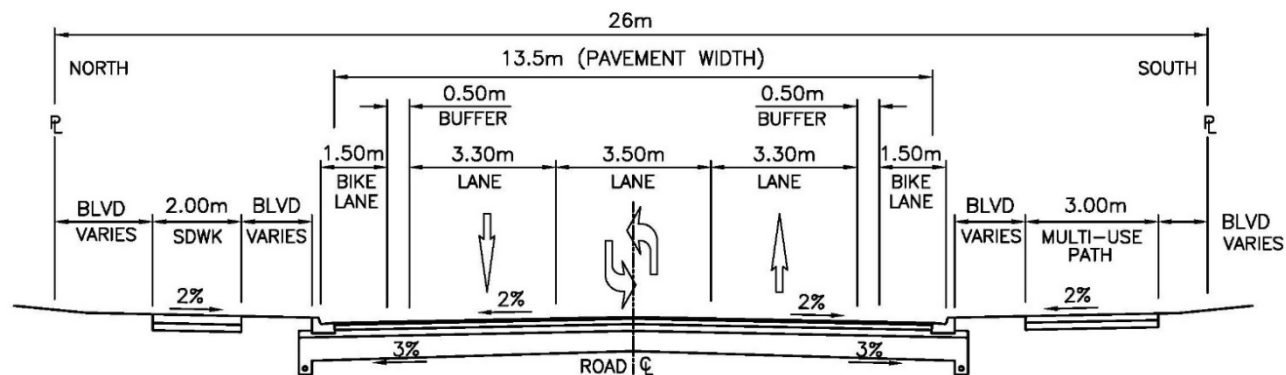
East Street to Dorval Drive Typical Cross-section
